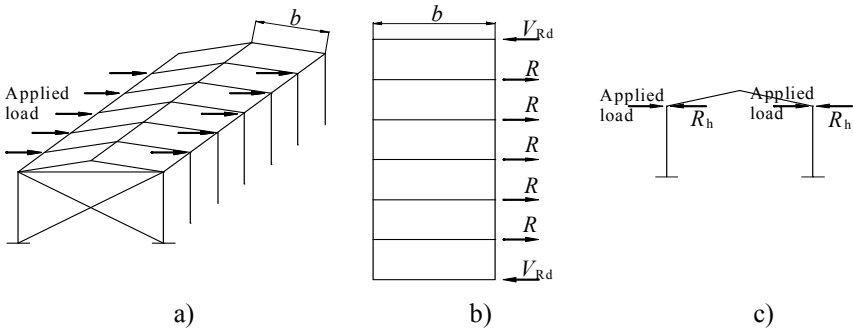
Distribution of horizontal (side) loads for plastic design of clad pitched roof portal frames
